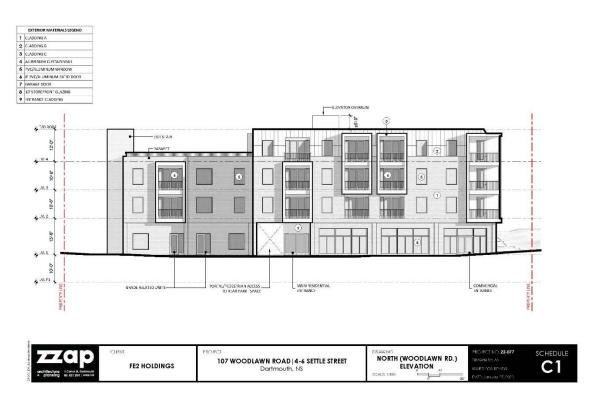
107 Woodlawn Road in Dartmouth, Nova Scotia
